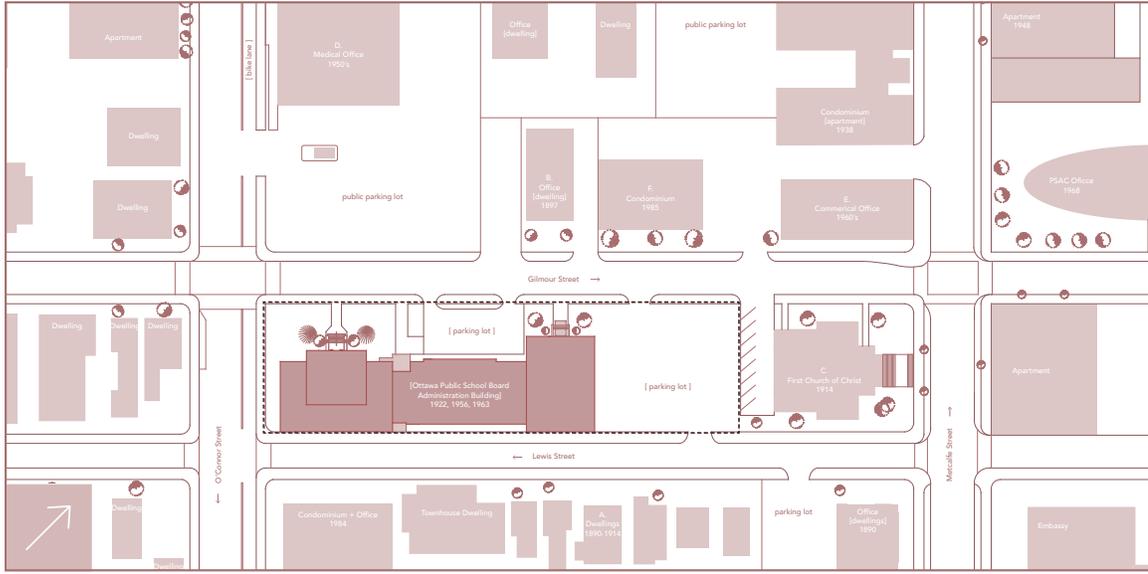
\_ 330 Gilmour Existing Site Plan
